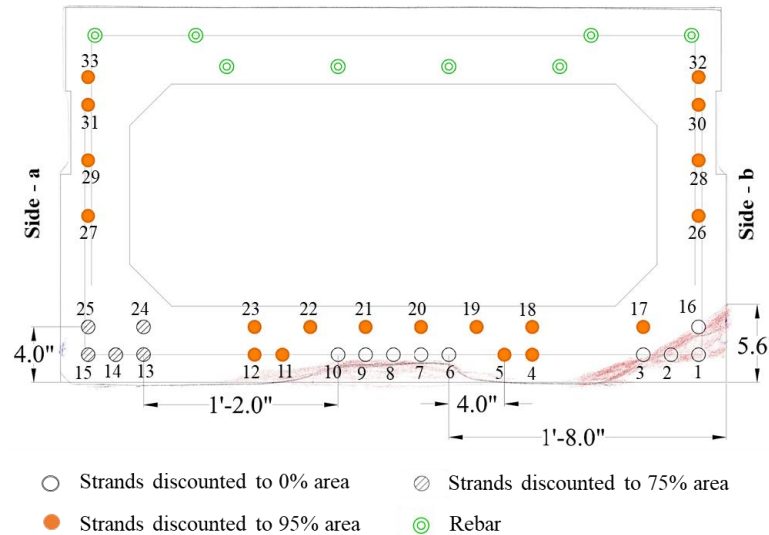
Overlay of Slice No. 18 (Near the Section of Failure in Test-2) from Box Beam-3 Dense Point Cloud with the Cross-Section Drawing
